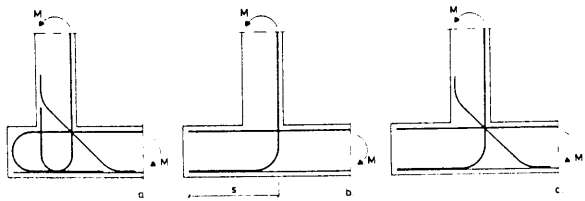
Layout of Reinforcement in Retaining Wall Corners
